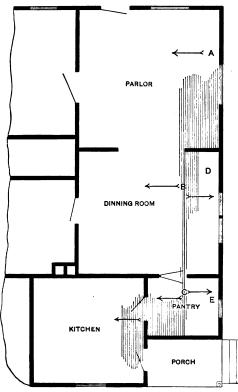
Partial Plan, Showing Method of Joining Floors in Adjacent Rooms
